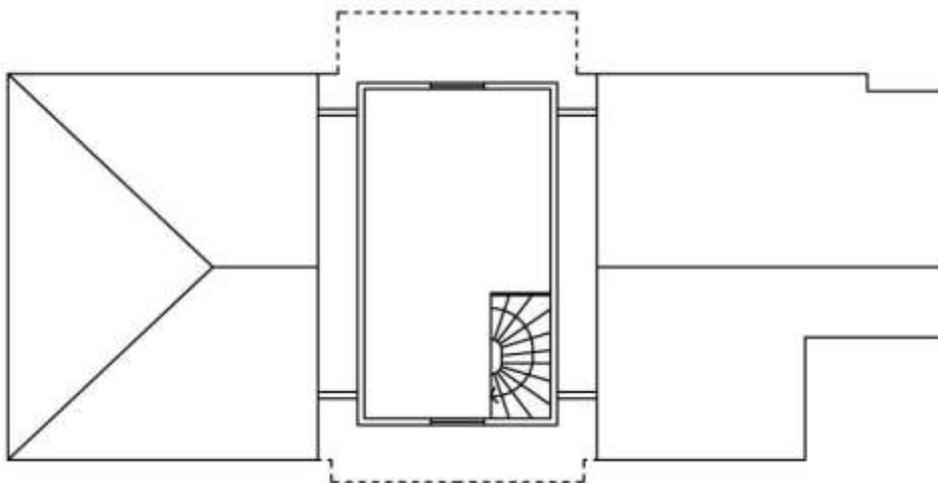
Penthouse floor plan of the house at 122 lot 14 parcel
